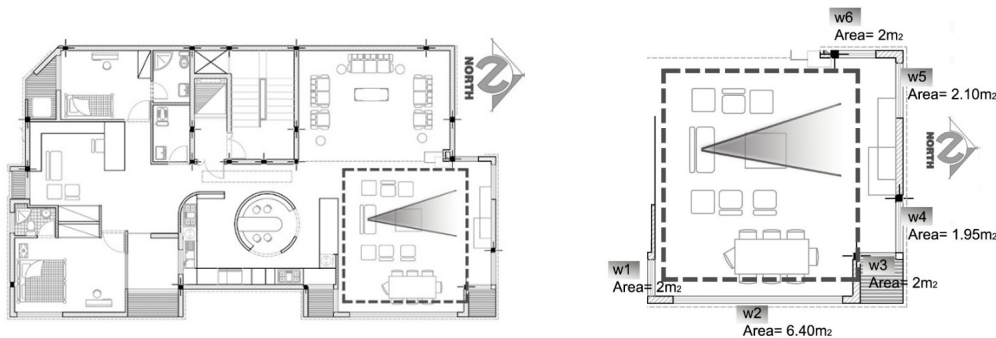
(A): Plan of the Living Room of in an Apartment Building, (B): Plan of the Living Room, Number and Location of Windows
